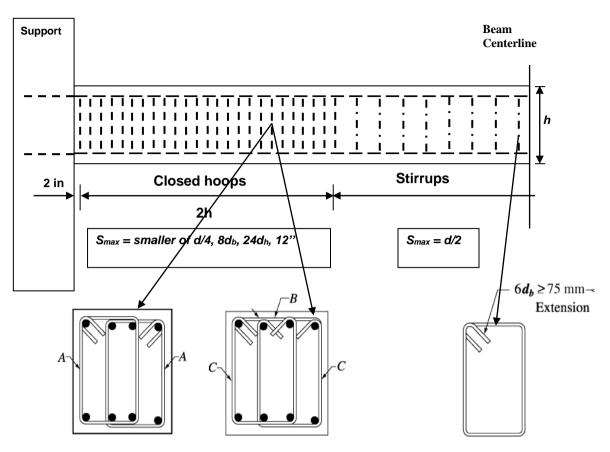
Arrangement of Transverse Reinforcement in RCC Beam
